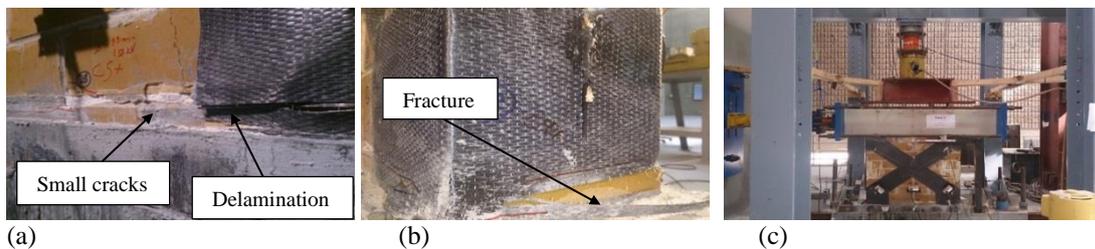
Some cracking patterns of undamaged specimen strengthened with CFRP
